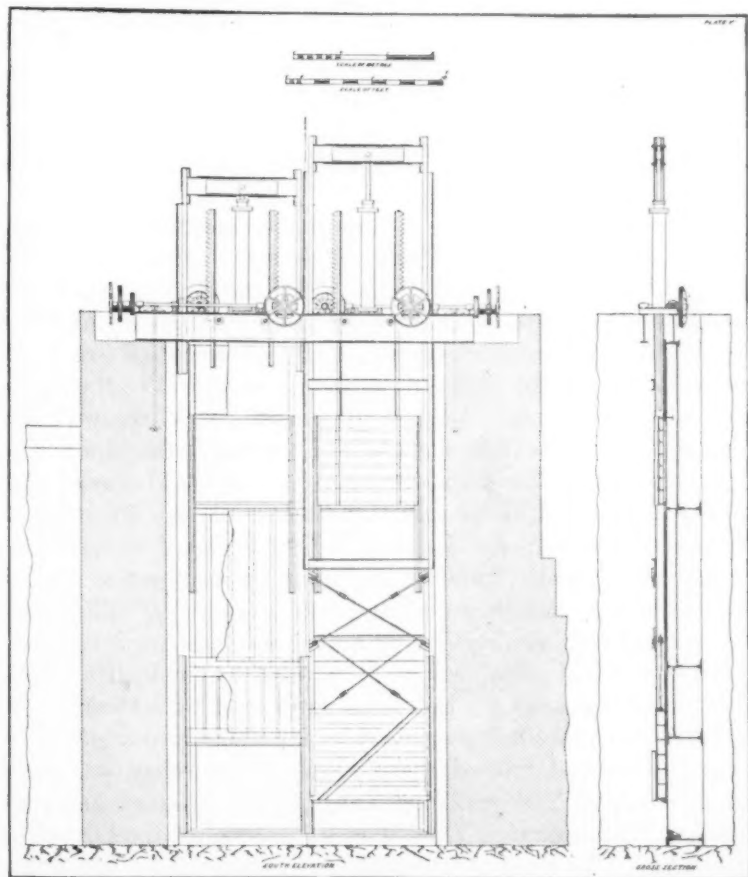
DETAIL PLAN OF WASTE GATE IN THE DAM.
